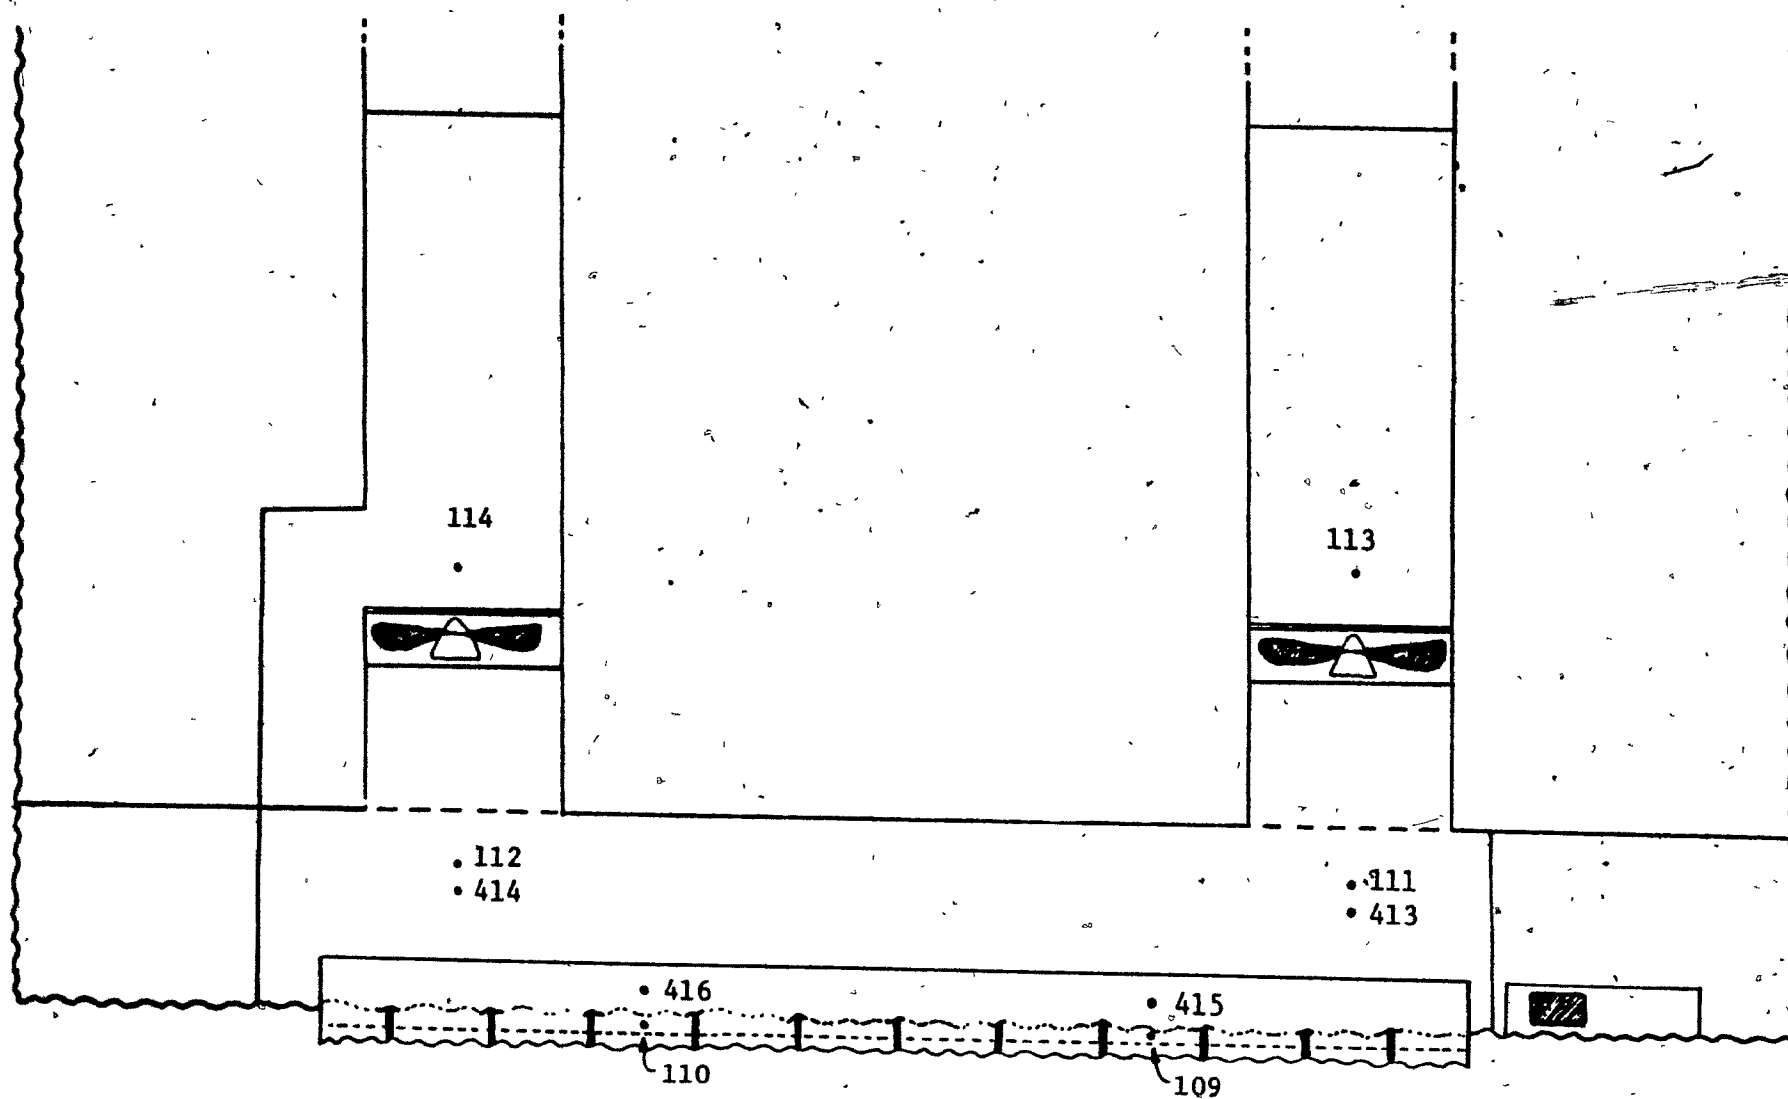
Plan View of Solar Wall, By-Pass Wall and Suction Plenum showing Thermocouple Locations
